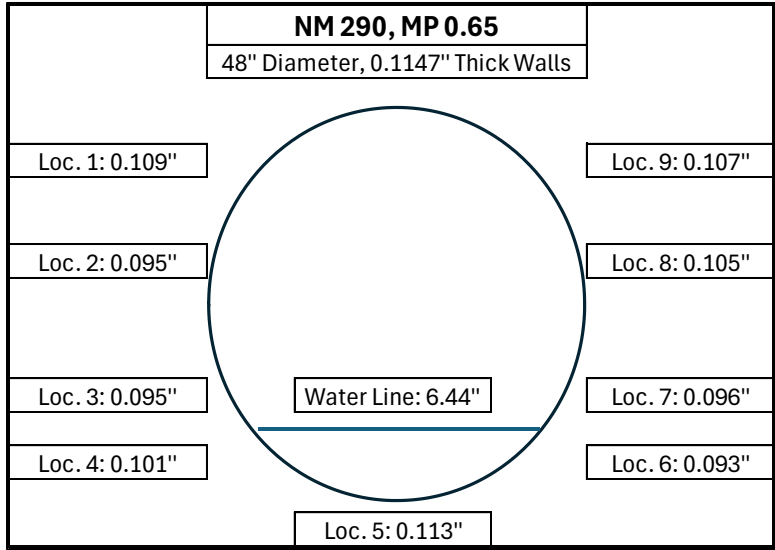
Diagram of inlet wall thickness measurements taken on NM 290 MP 0.65 culvert.
